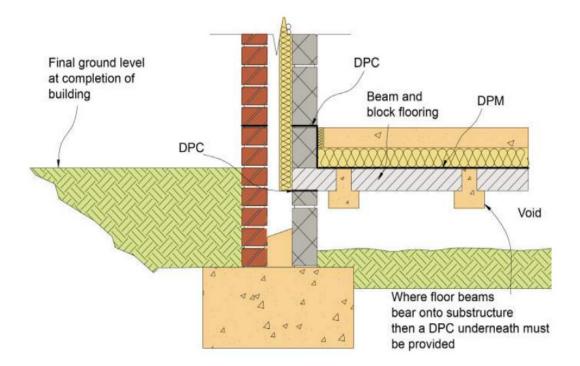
Cross section of the Substructure of a cavity wall building
